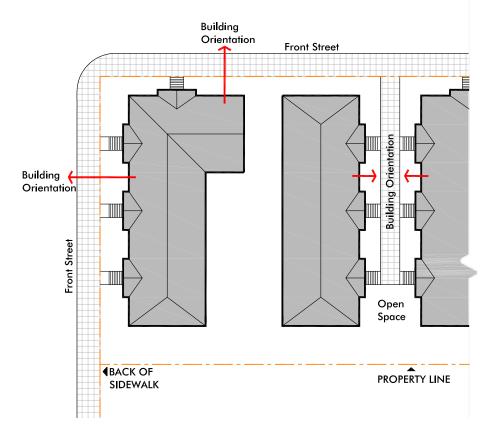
Building Orientation to Streets and Public Open Spaces
